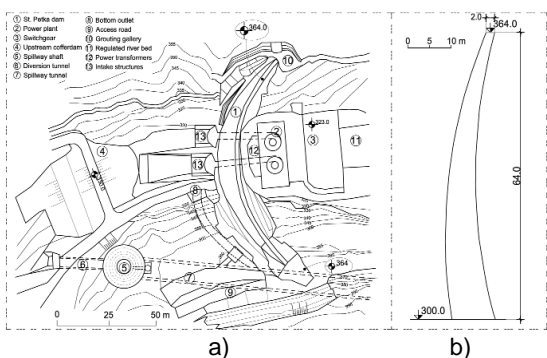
St. Petka dam. a) Dam layout, b) Central cross-section.
